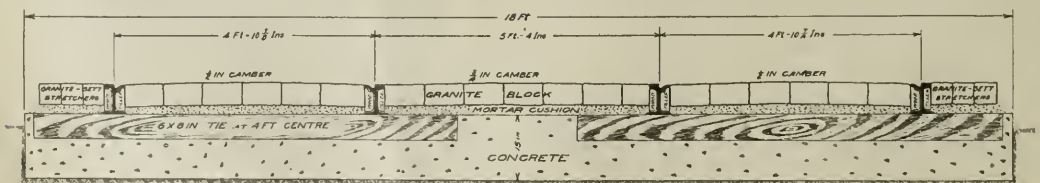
Granite Block with 7-in. Girder Rail, 1915 Construction
